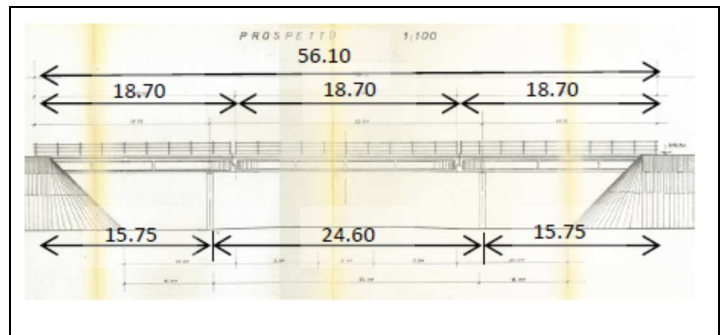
Original design drawings of the bridge: sideview / Disegni del progetto originale: prospetto laterale.
